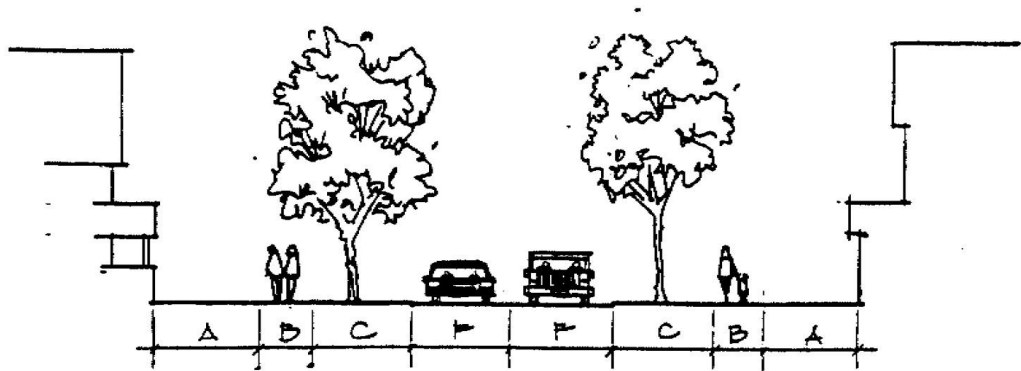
Schematic sketch of a typical local street cross-section. Table 1 lists the recommended dimensions of each component: A) building setback from street right-of-way; B) walkway; C) planting area; F) travel lane.
